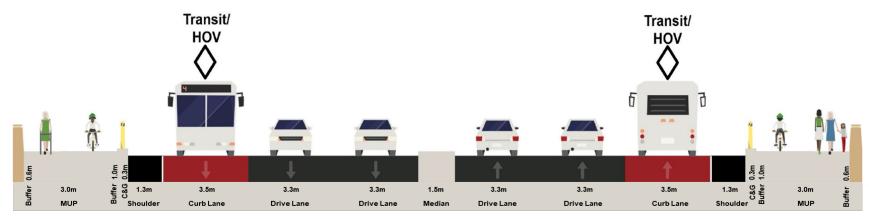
Alternative 1 - AT facilities on both sides
